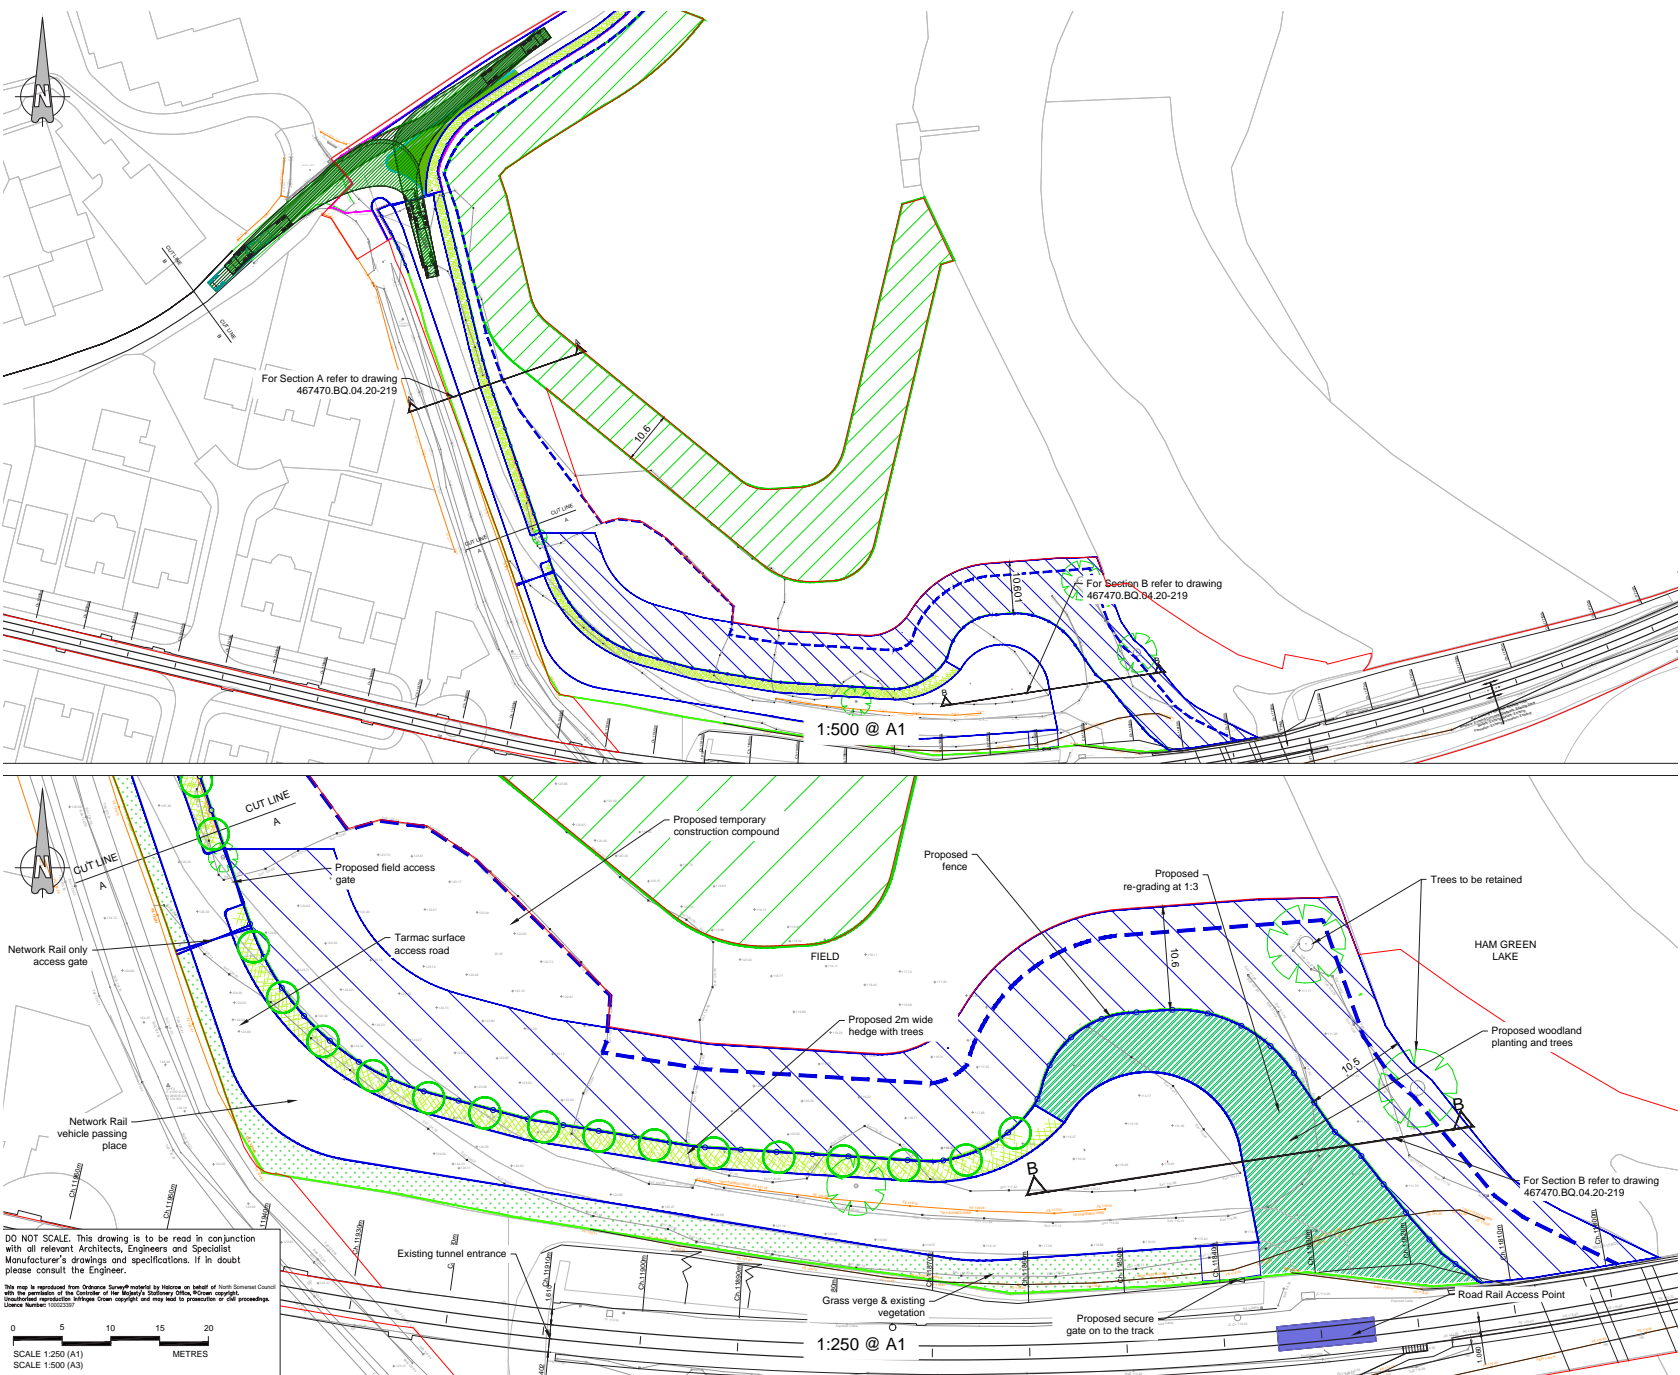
Pill Tunnel Eastern Portal proposal (467470.BQ.04.20-221)
